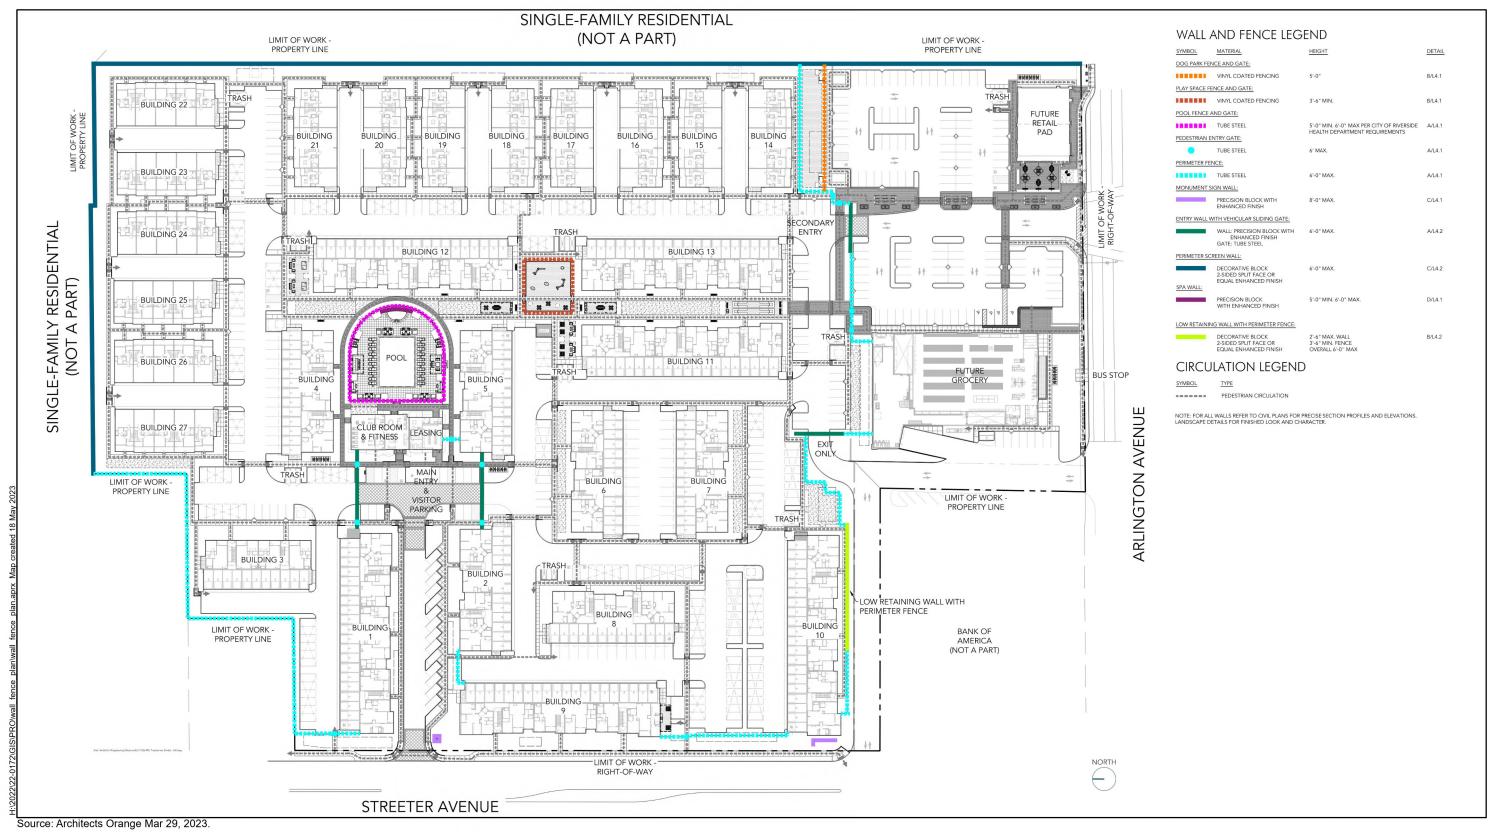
Wall and Fence Plan Arlington Mixed Use
